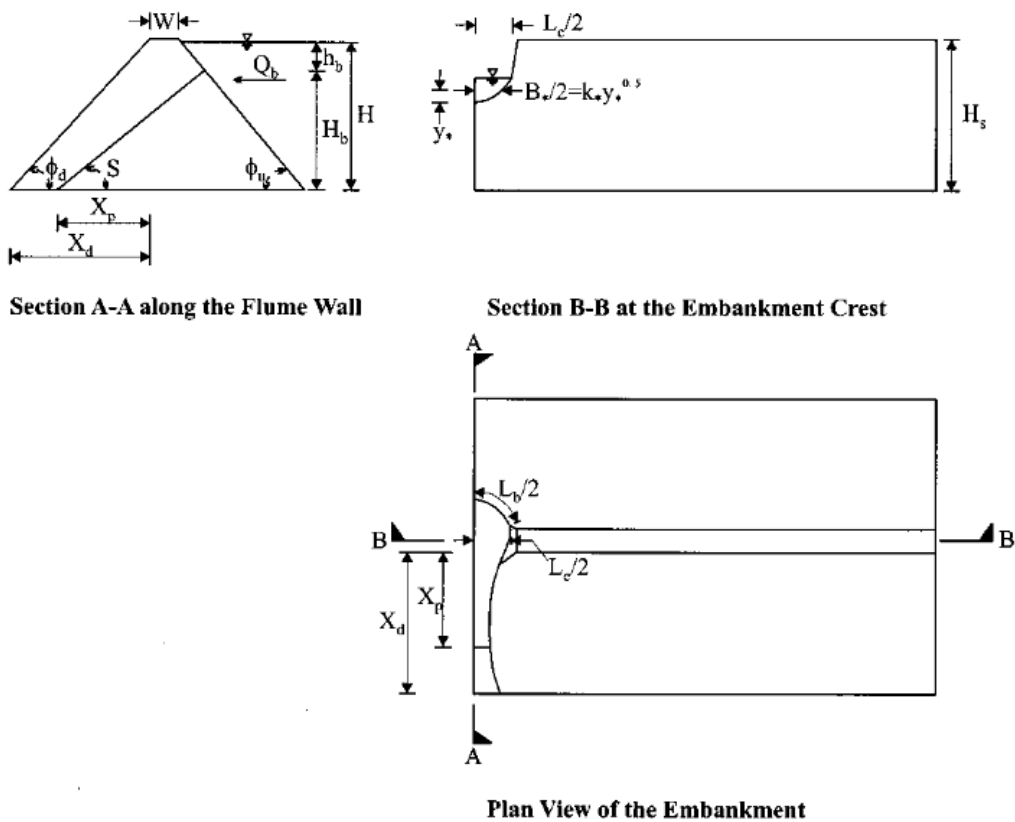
Geometry parameters for breached embankment. Half-breach section tested is shown
